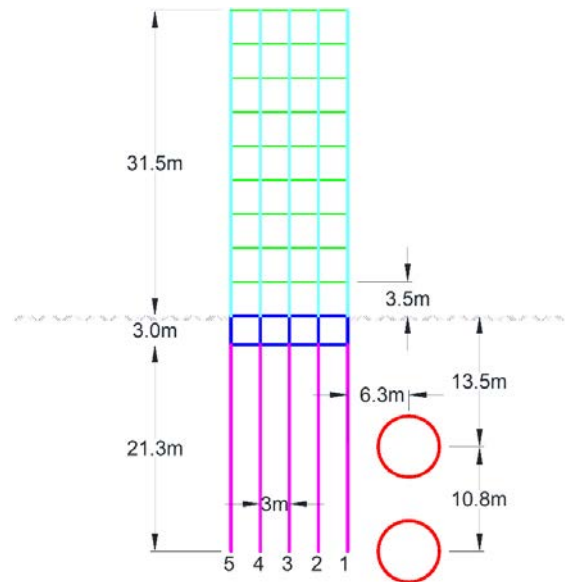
A case study of twin stacked tunnels, a building, and its foundation
